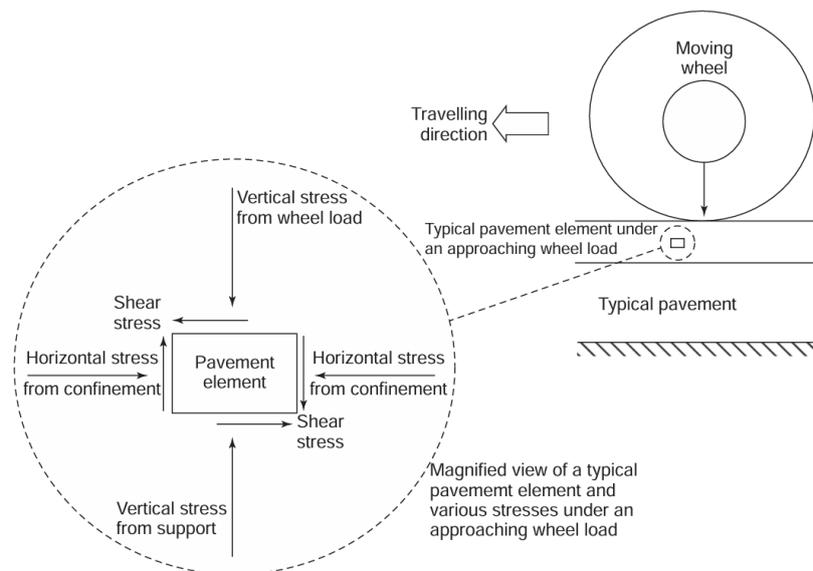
The strains placed on a typical pavement element by an approaching tire load [5]
